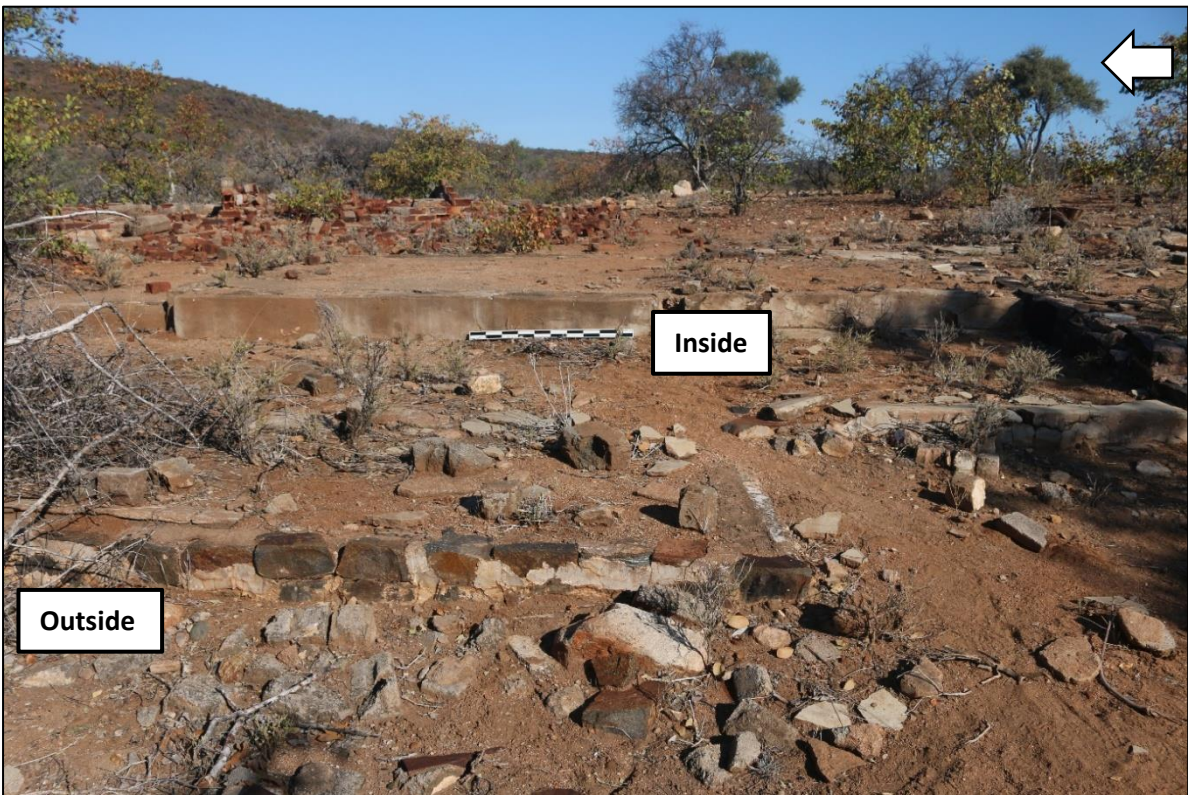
Illustrating outside stone foundation and inside stone foundation covered in concrete. Building 1. Area C.
